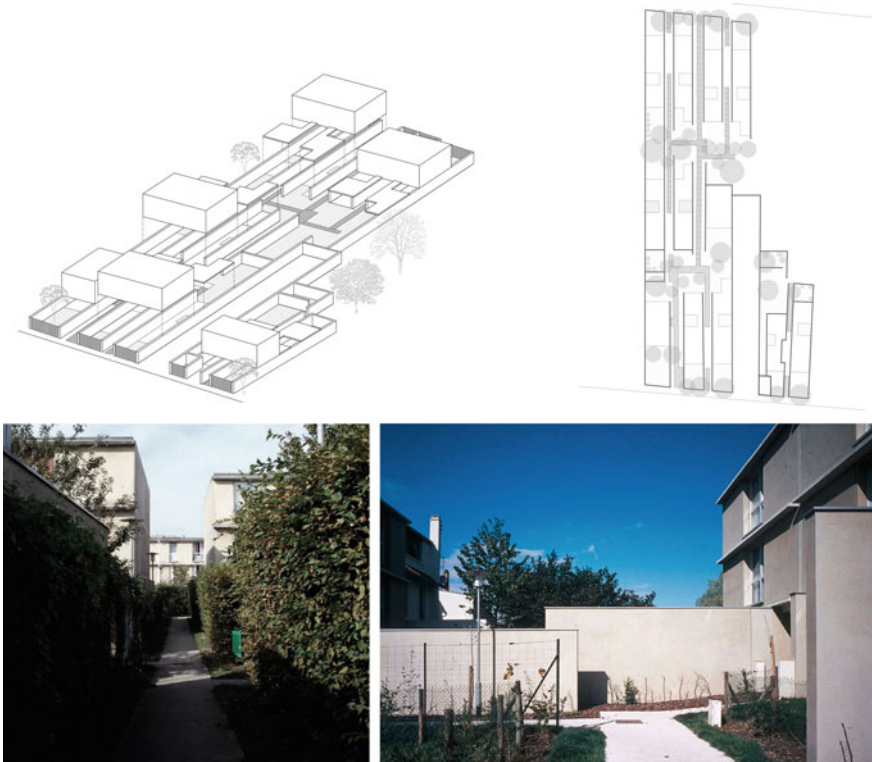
Plan, axonometric view (author) and pictures of gardens in BNR's Montreuil housing. Author's drawing (top) and image copyright (downside): DC by AMC architecture
